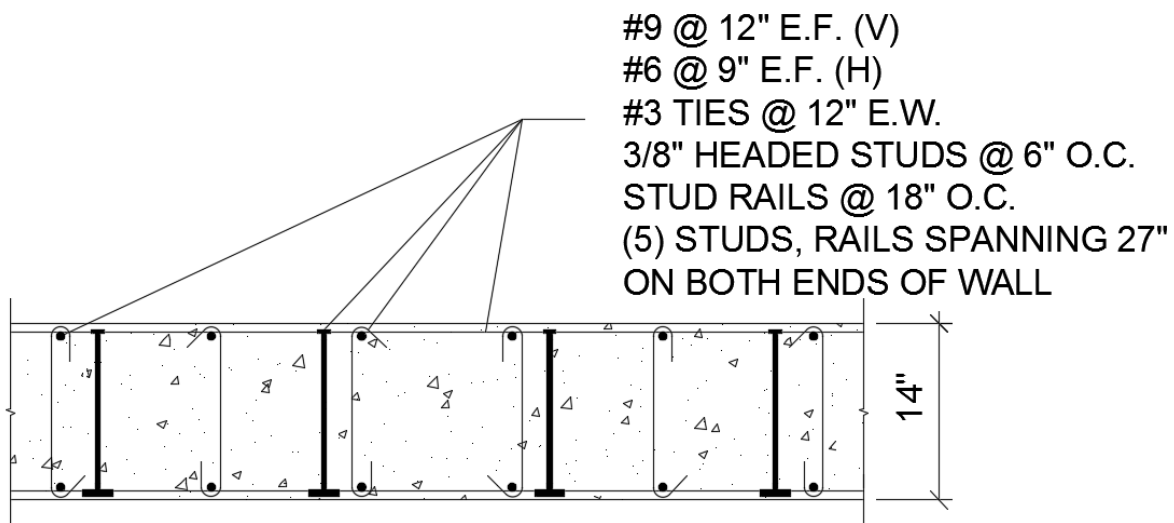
New exterior wall, cross-section at the 2nd floor level based on tsunami design requirements.
